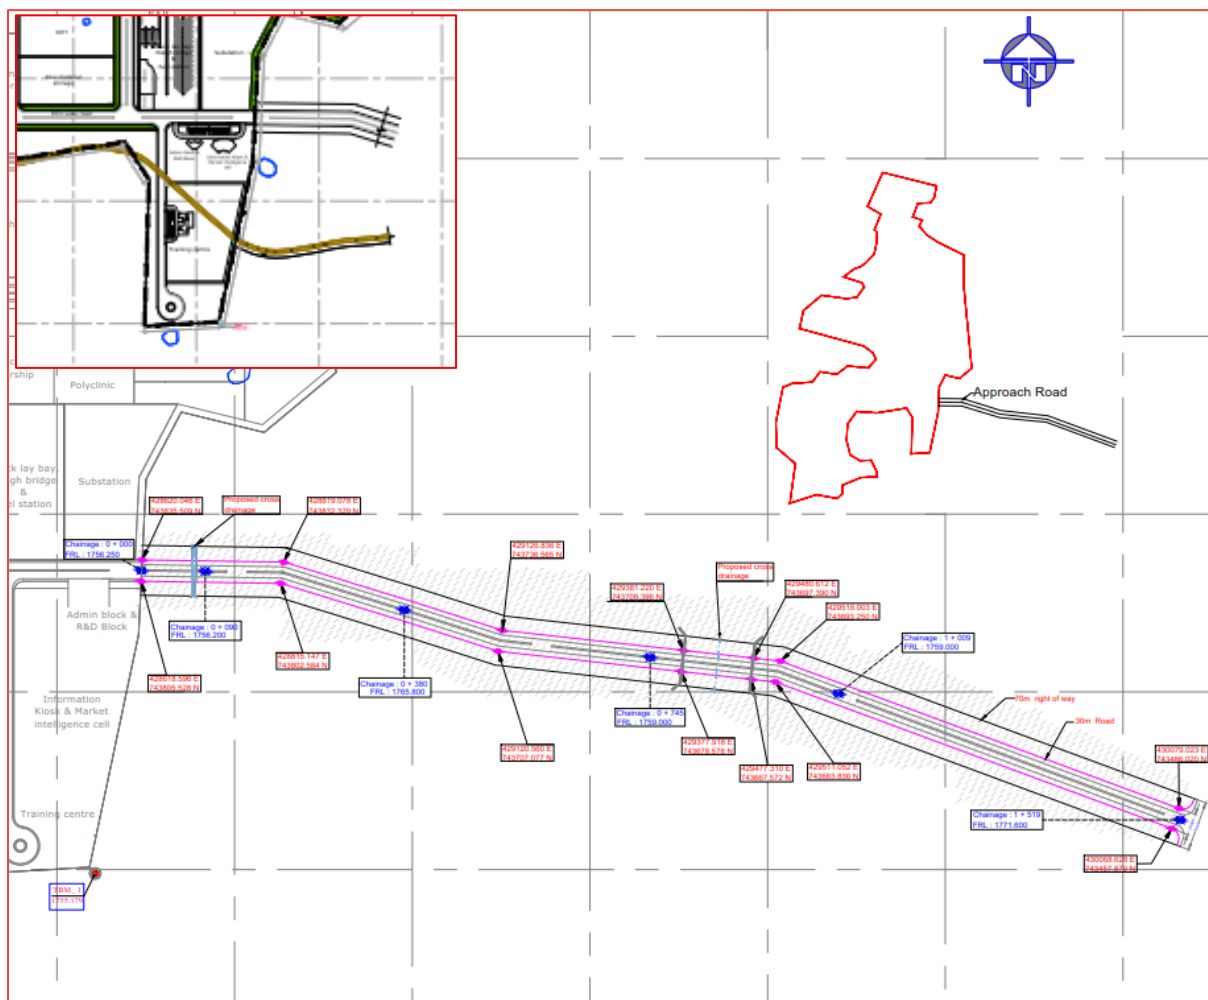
proposed access road alignment (Source: MACE Drawing No. MACE-P942-ESNNP-YA-ER-005)
